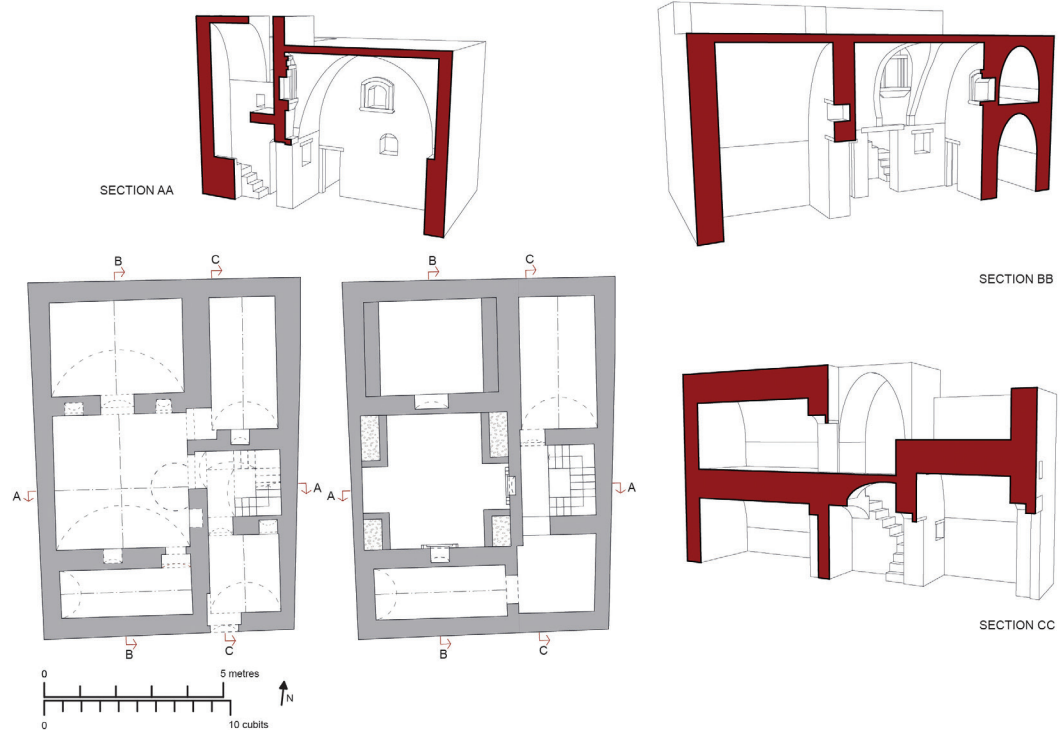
Hypothetical virtual reconstruction of Unit A: floor plans and perspective sections.
